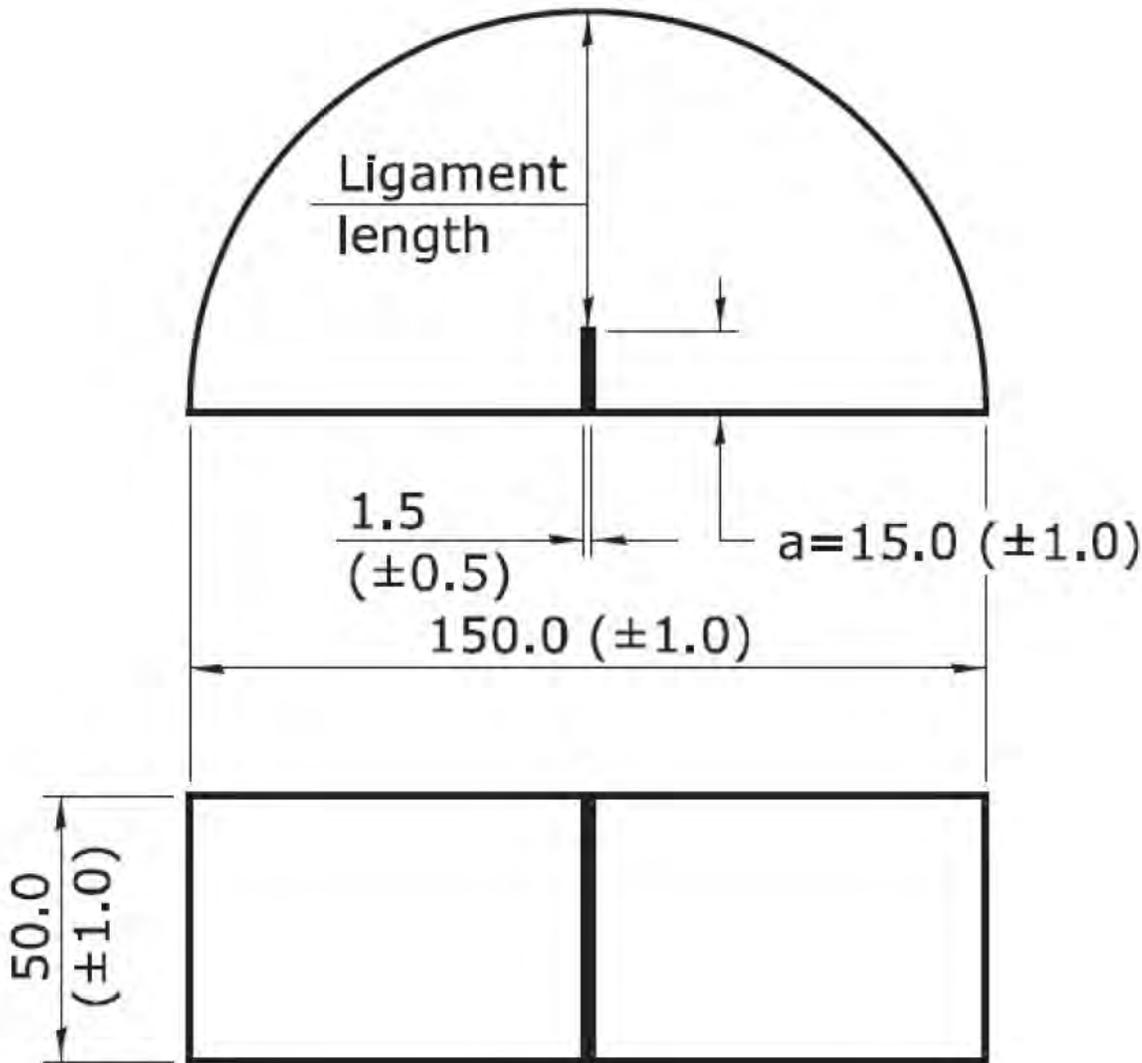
FIT SGC Laboratory Compacted Specimen Configuration (dimensions in millimeters)
